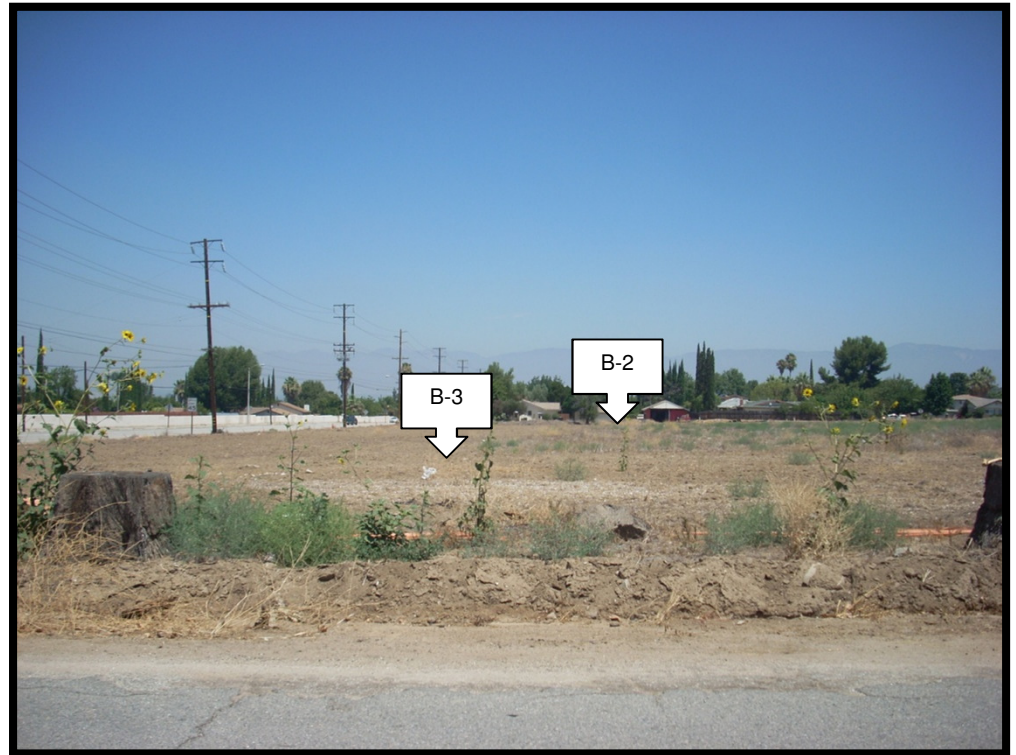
Viewing north-northwest from southern property boundary. Sample locations shown.
